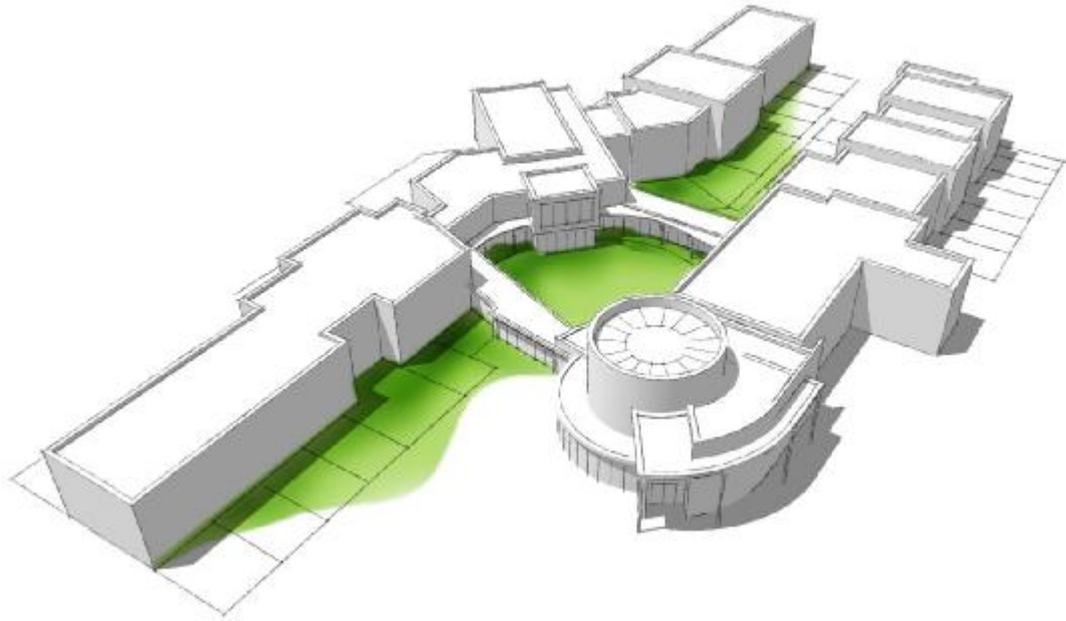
Illustrative 3D massing study, to demonstrate general arrangement of Low Secure Unit (viewed towards main entrance)
